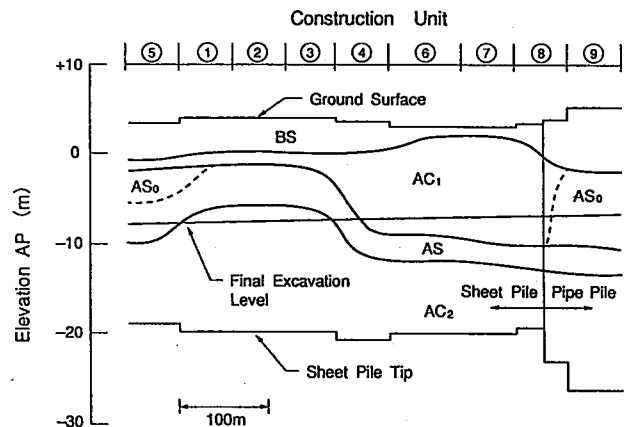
Soil Profile and Layout of Construction Section (Tanaka et al., 1989)
